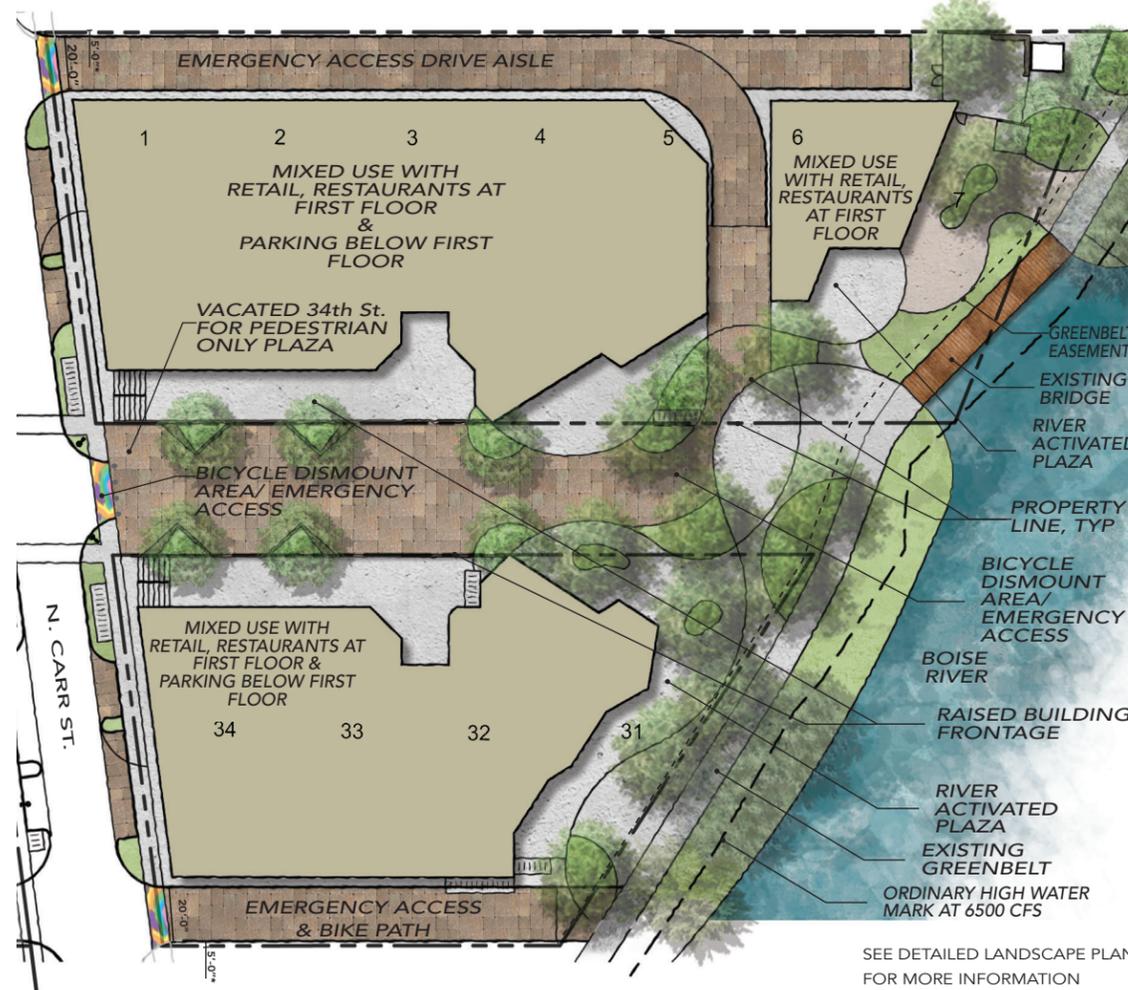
FIGURE : SITE PLAN - RIVER LOTS- BLOCKS 30 & 34
